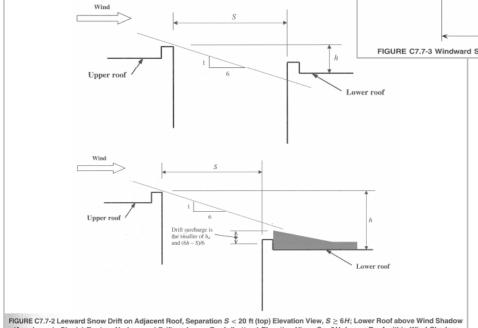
Leeward Snow Drift on Adjacent Roof, Separation S < 20 ft (top) Elevation View, $S \ge 6H$; Lower Roof above Wind Shadow (Aerodynamic Shade) Region, No Leeward Drift on Lower Roof. (bottom) Elevation View, S < 6H; Lower Roof within Wind Shadow (Aerodynamic Shade) Region, Leeward Drift on Lower Roof; Drift Length Is the Smaller of (6H - S) and $6H_D$
